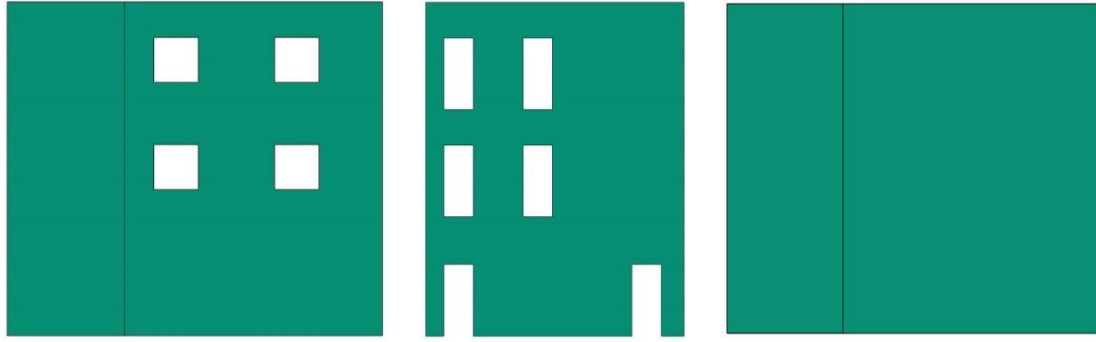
a) External walls; b) internal walls; c) U1-U2 and U2-U3 shared walls
